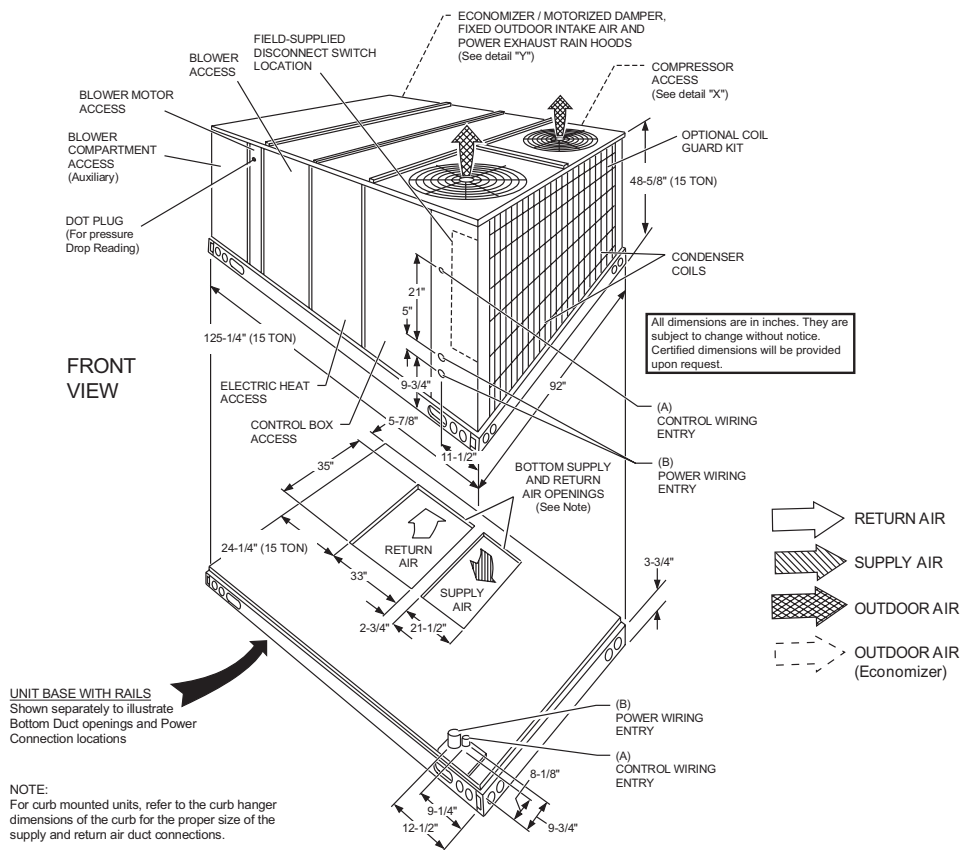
UNIT DIMENSIONS - 15 TON
